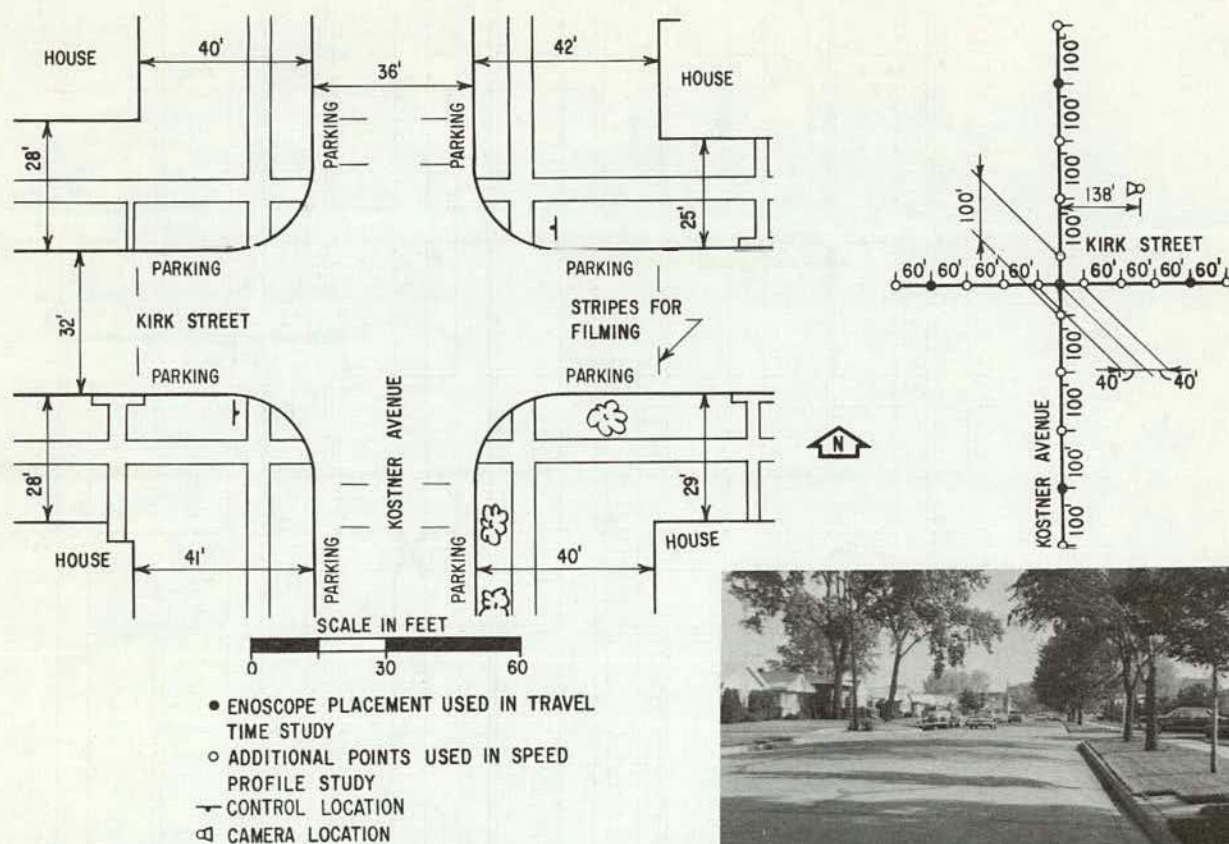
Intersection at Kirk Street and Kostner Avenue (site B).
